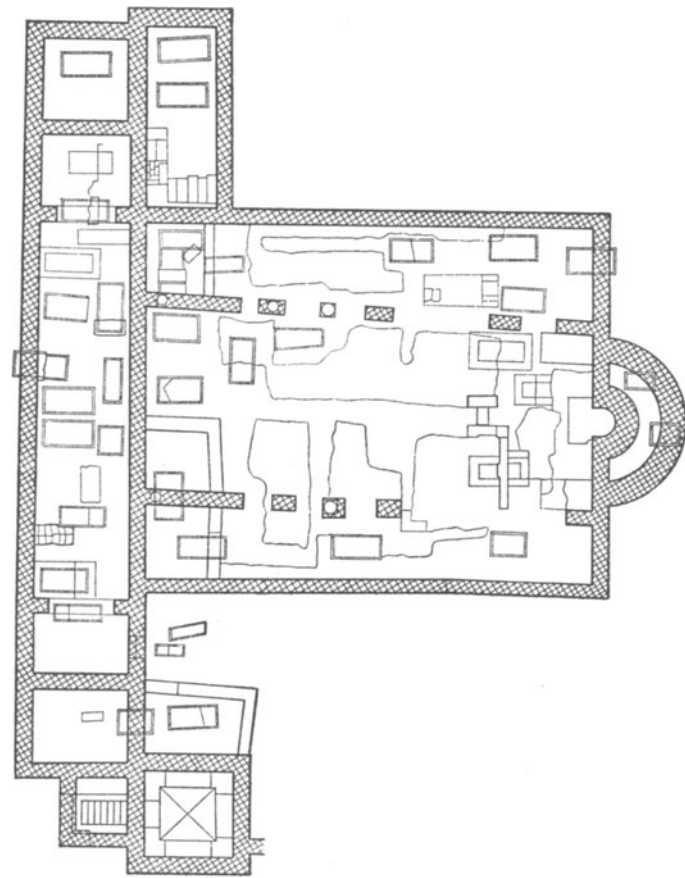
CEMETERY BASILICA, STOBI. PLAN
